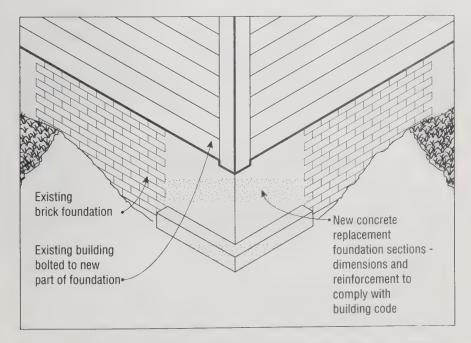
Retrofitting URM foundation by partial demolition and replacement.
